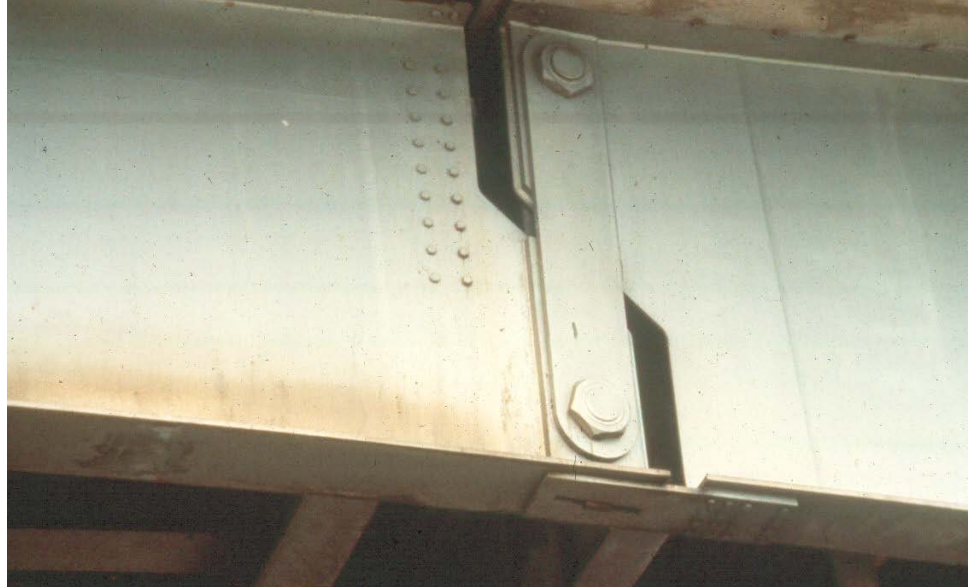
Two-Girder Bridge with Pin-and-Hanger Assembly
